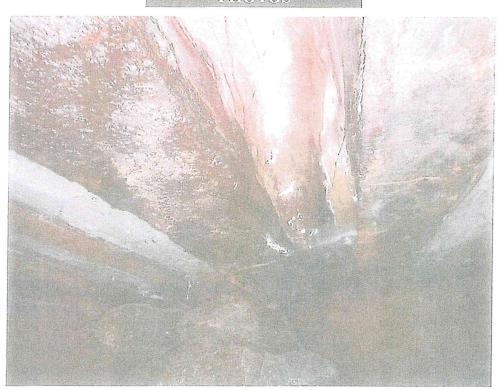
Typical condition of the bottom flanges of the steel I-Beams showing severe rust, lamination, and some section loss/ Wooden planks between beams.
